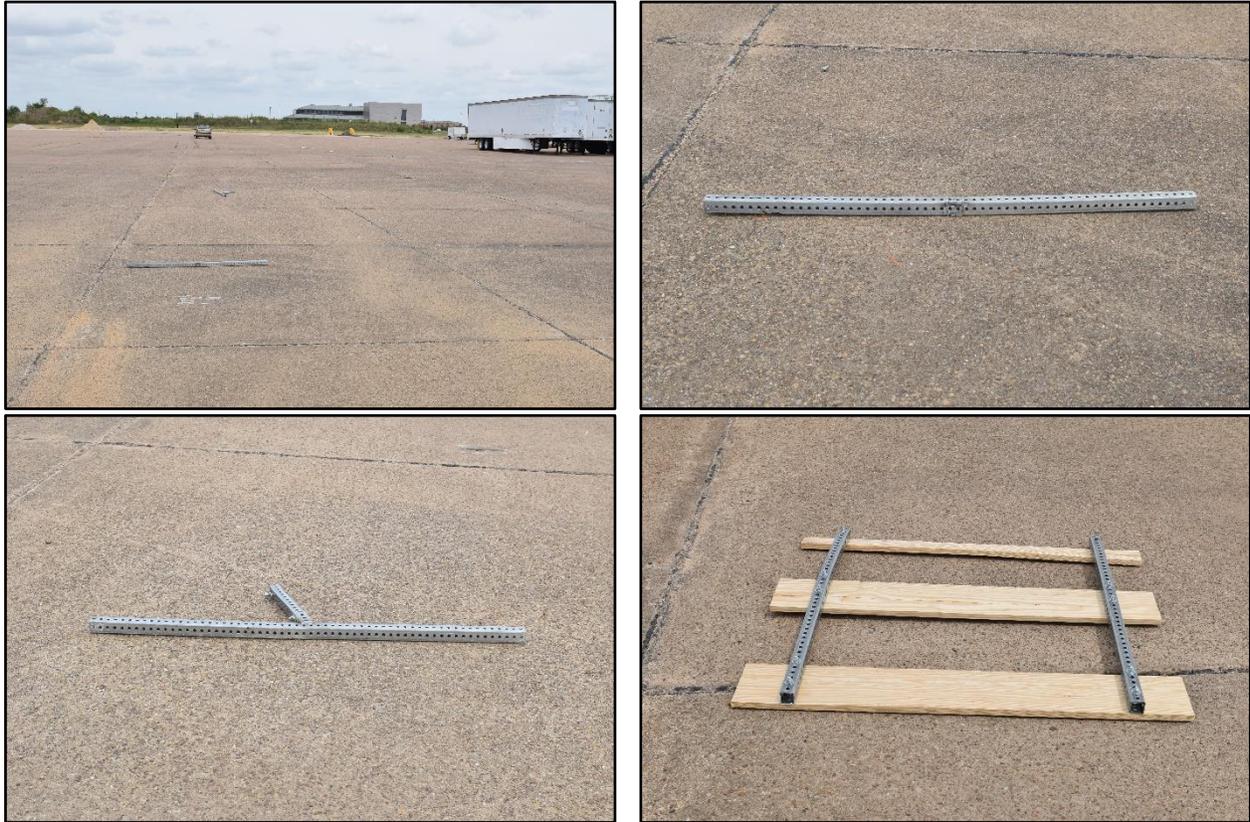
Type III Barricade after Test No. 469469-12-04.
